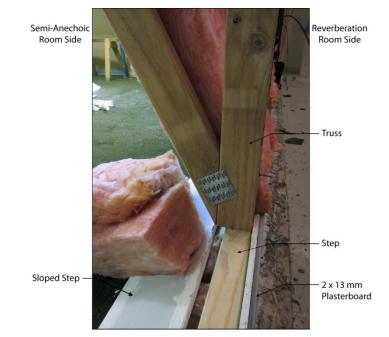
Step on which the trusses were installed. Note that the photo was taken when the wall system was being removed at the conclusion of the measurements. Missing from the photo is the layer of plasterboard on the ceiling which would fill the gap between the sloped step and the timber.
